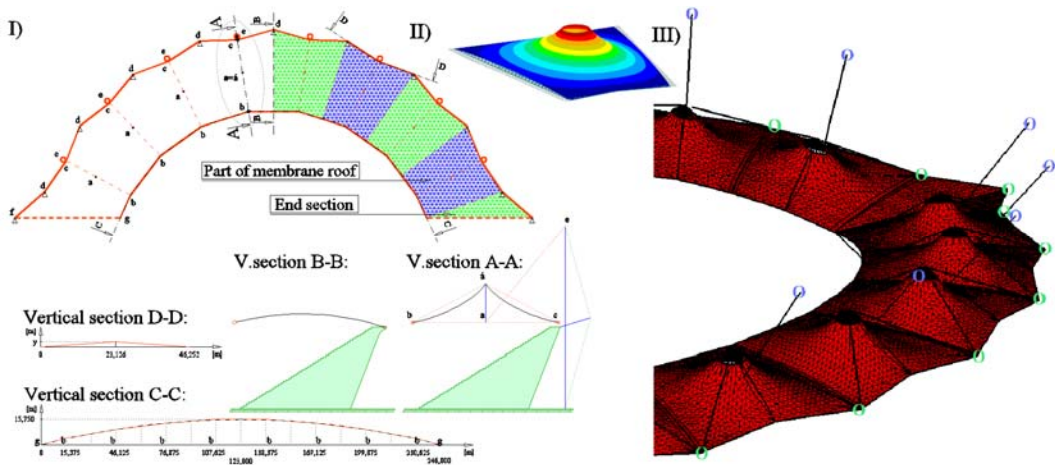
I) Schematic plan shows of one half of the stadium roof, II) Recurring motif of the resulting shape, III) Part of a global model of membrane roof
